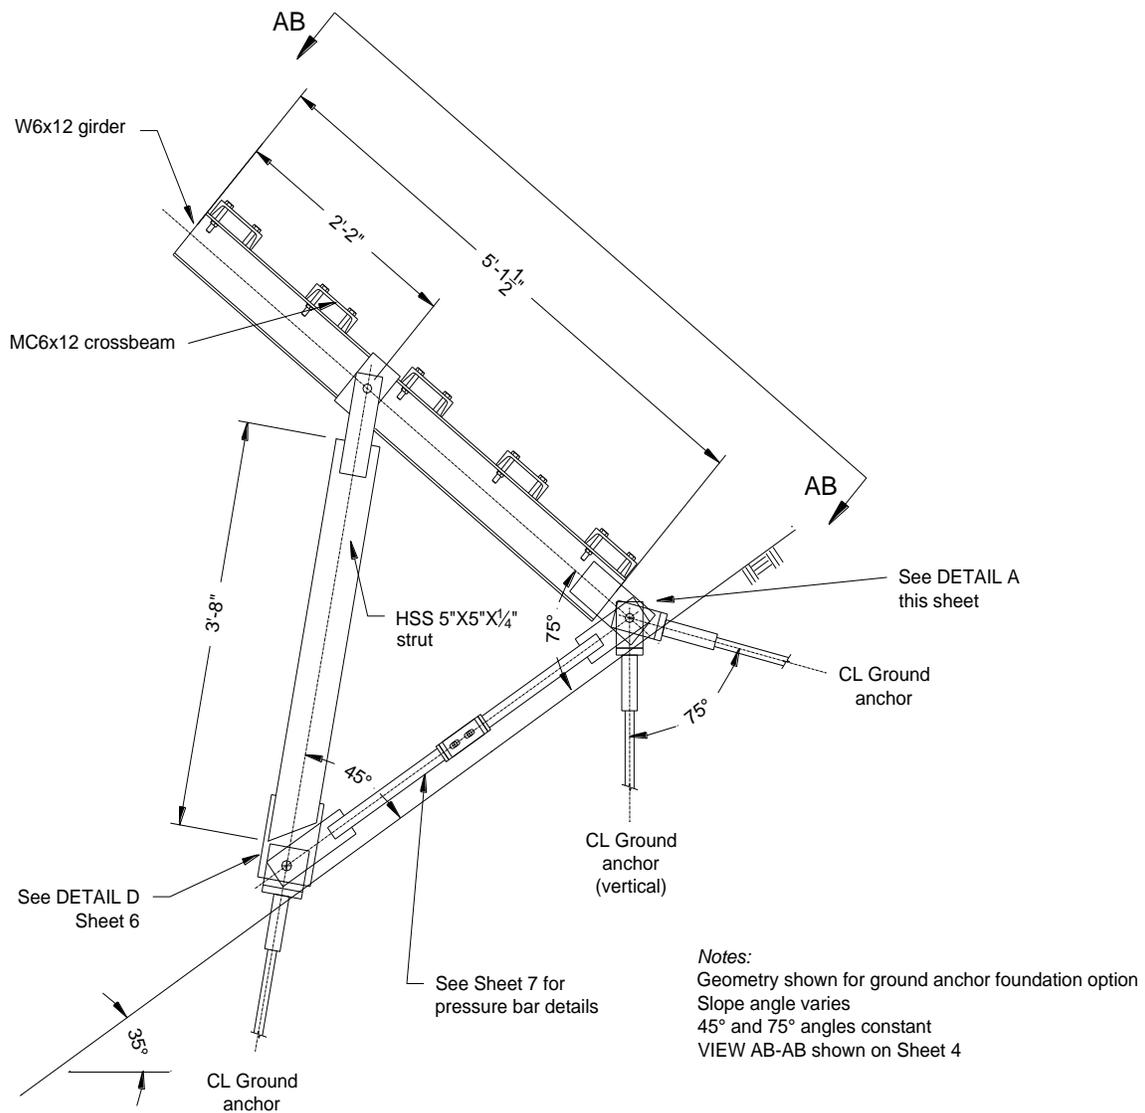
Side elevation view of snow supporting structure on ground anchor foundations.
